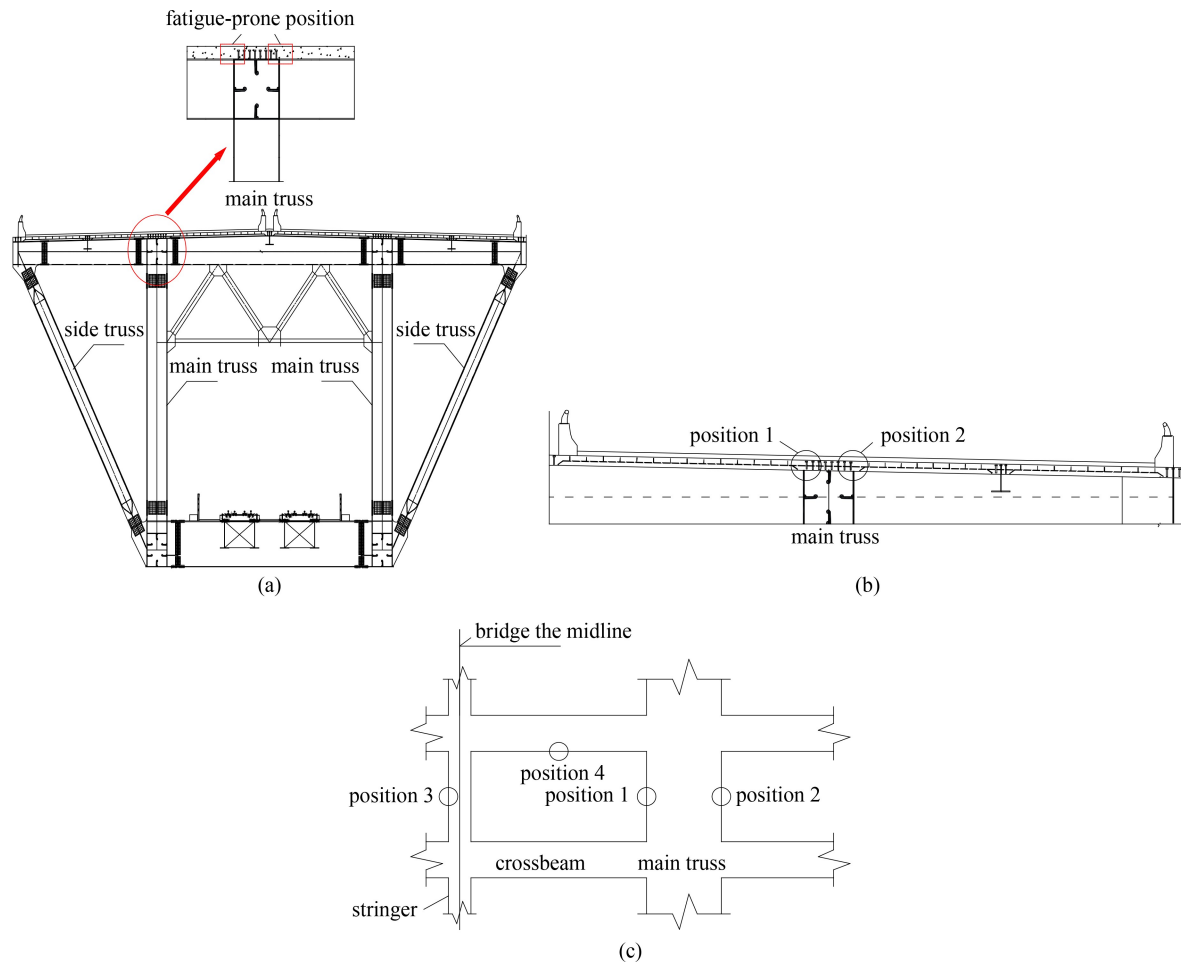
Schematic view of fatigue-prone positions in composite deck of the Nansha Port Bridge: (a) elevation view; (b) elevation view in close-up; (c) plan view.
